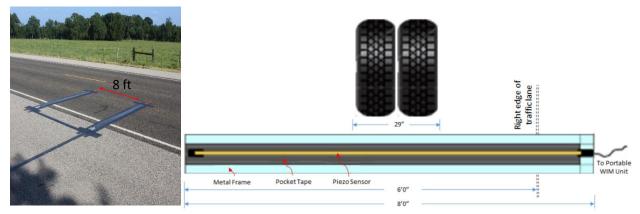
Piezo Sensor Installation Using Custom-Devised Metal Plates.
